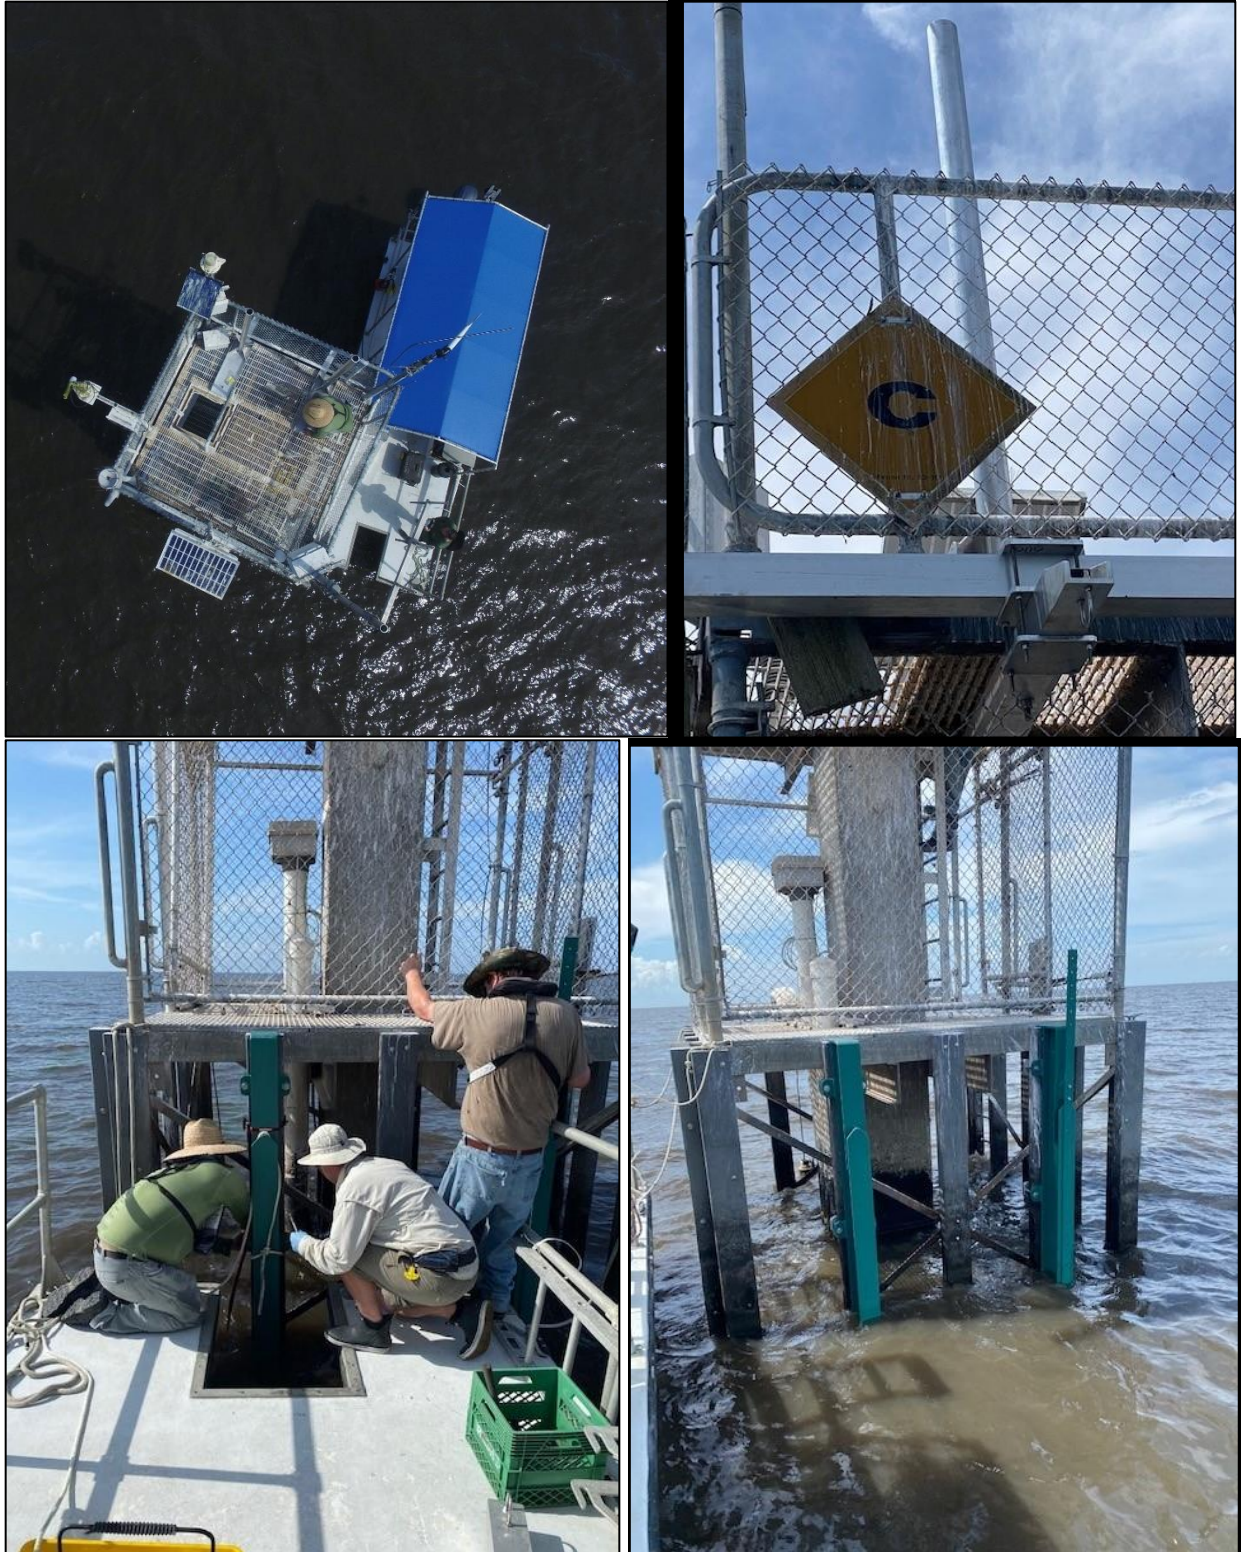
Installation of the I-beams and other support structure on instrument tower L001, 5/12/21, including (clockwise from top left): aerial view of HBOI small boat secured to the tower, lift point, HALO field team finalizing I-beam installation, and completed I-beam installation.
